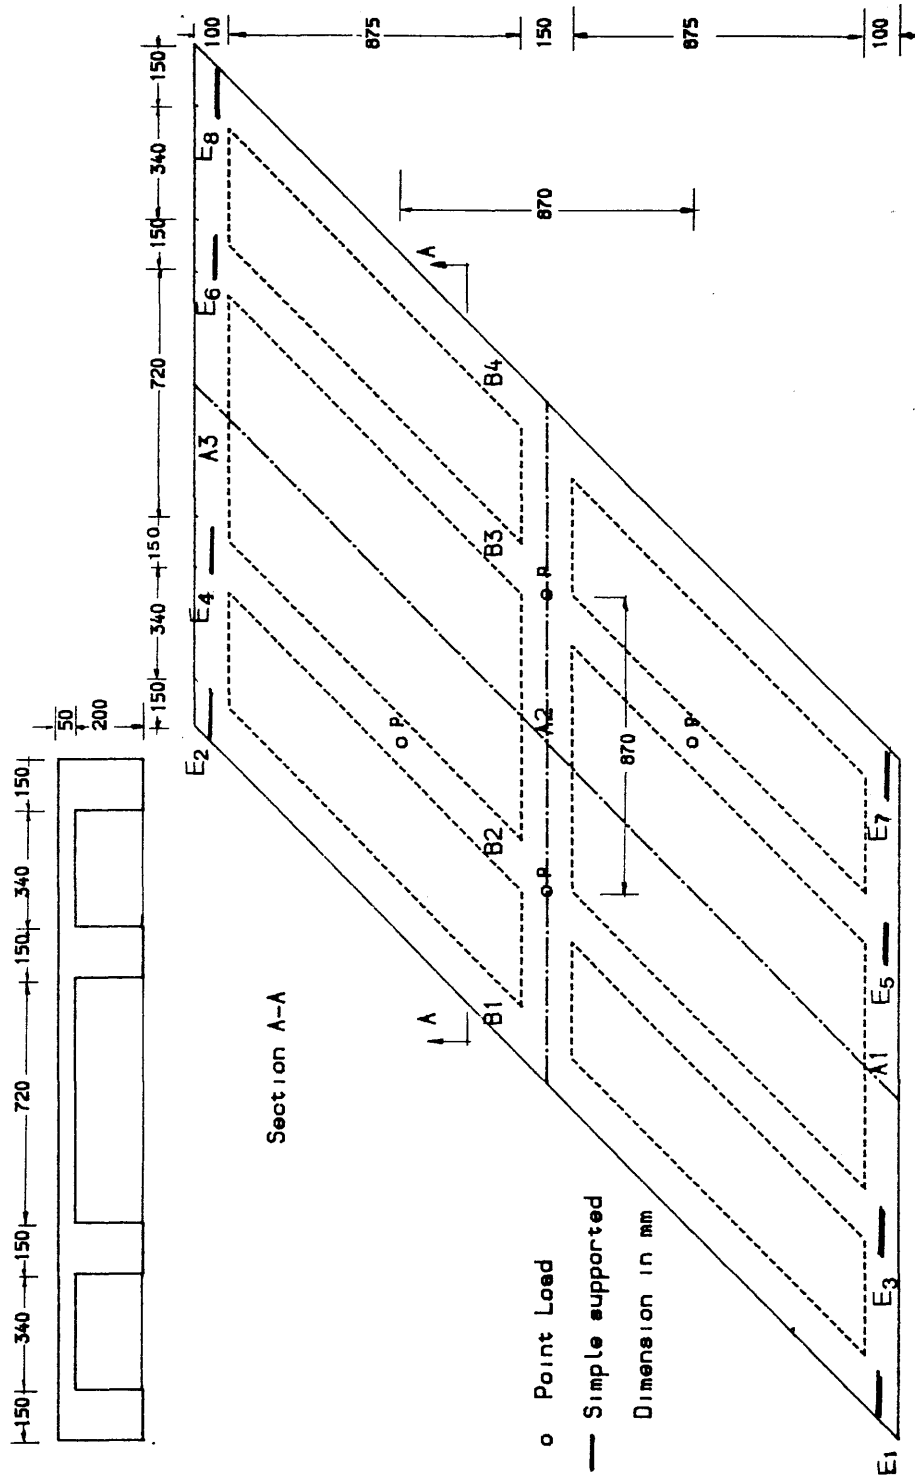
Ribbed Skew Slab Model No. (6)
